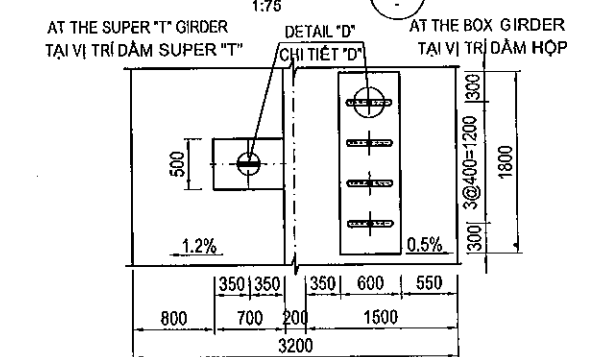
DETAIL ANTI COLLIDING - CHI TIẾT Ụ CHÔNG XÔ
